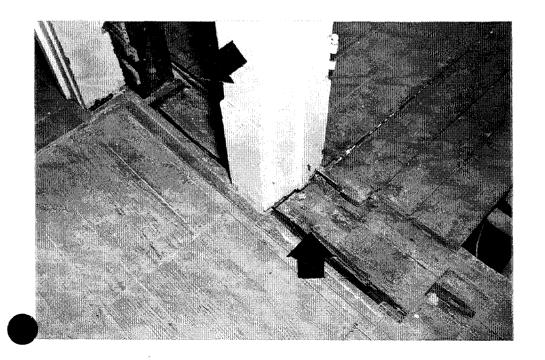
TOP OF SILL BEAM AT EAST WALL OF 1851 COT-TAGE
